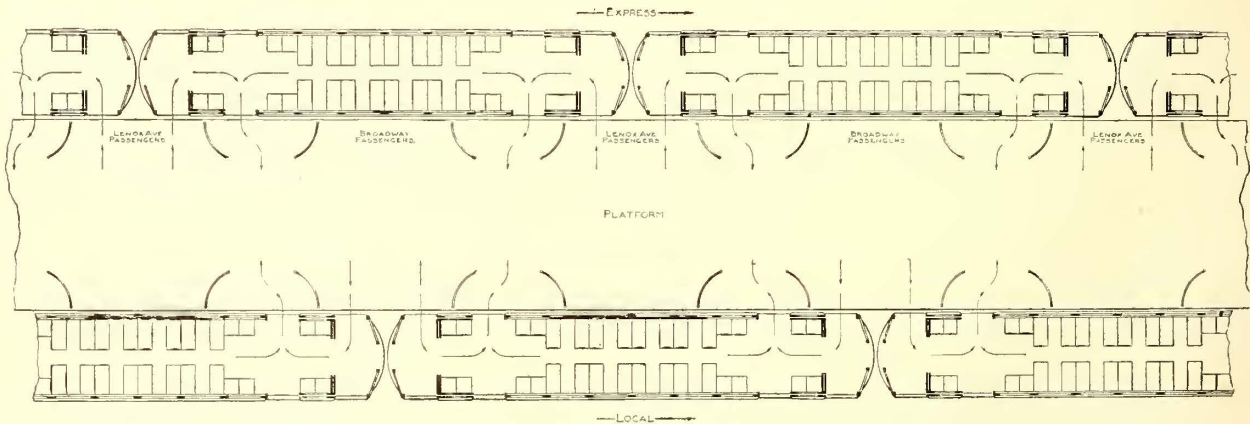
SHOWING ARRANGEMENT OF GUIDING RAILS ON STATION PLATFORMS, TO BE USED IN CONNECTION WITH RECOMMENDED TYPE.
